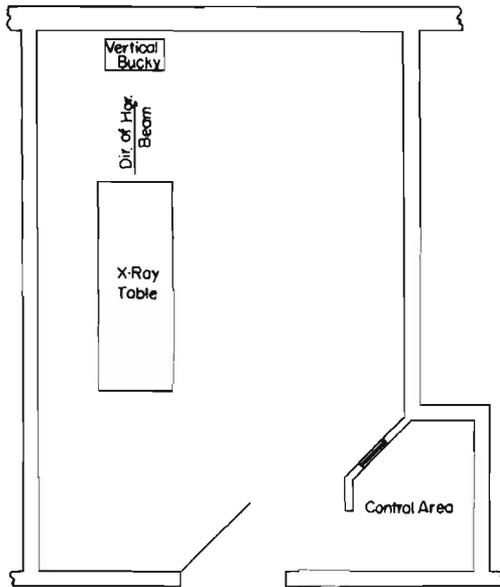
Typical design for installation with control panel located within the radiographic room.
